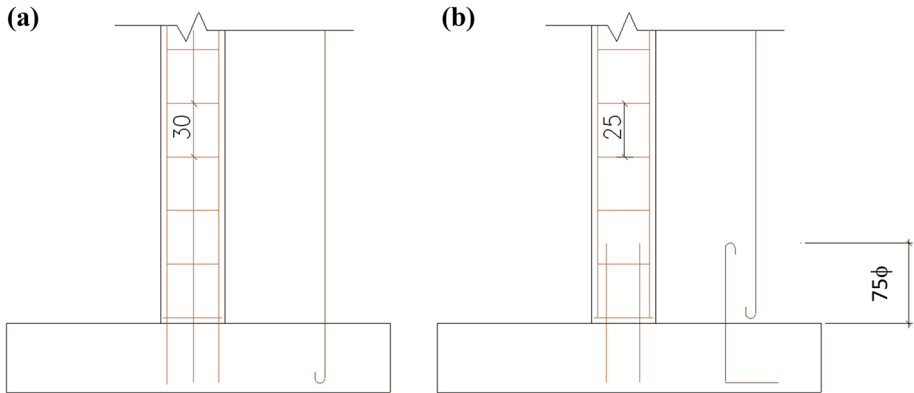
Column longitudinal bar anchorage detail a type I (continuous) and b type II (lap-spliced)
